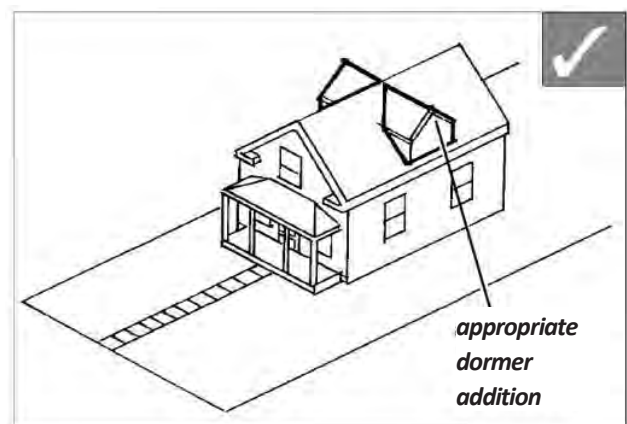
When adding dormers to an existing roof, it should be in scale and character with the primary structure.
